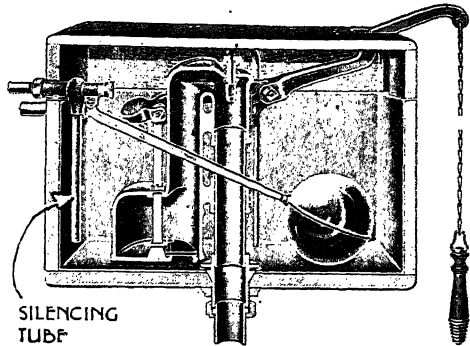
SECTION THROUGH NOISELESS FLUSHING CISTERN (Clark Hunt & Co., Ltd.)
